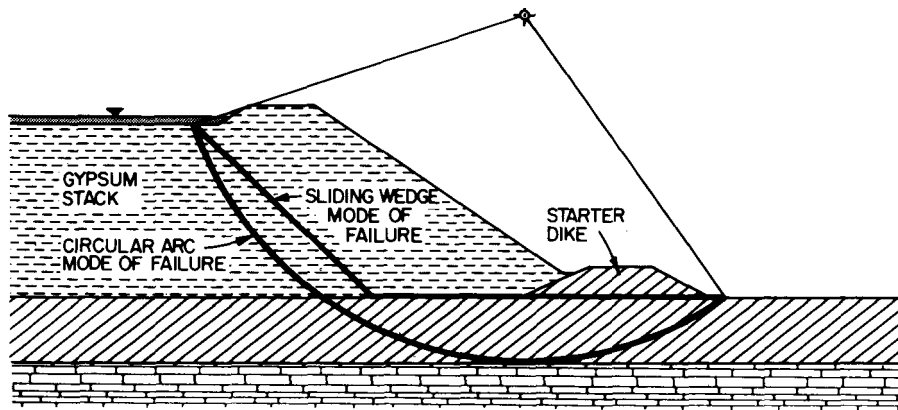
Bearing Capacity Type Foundation Failure
